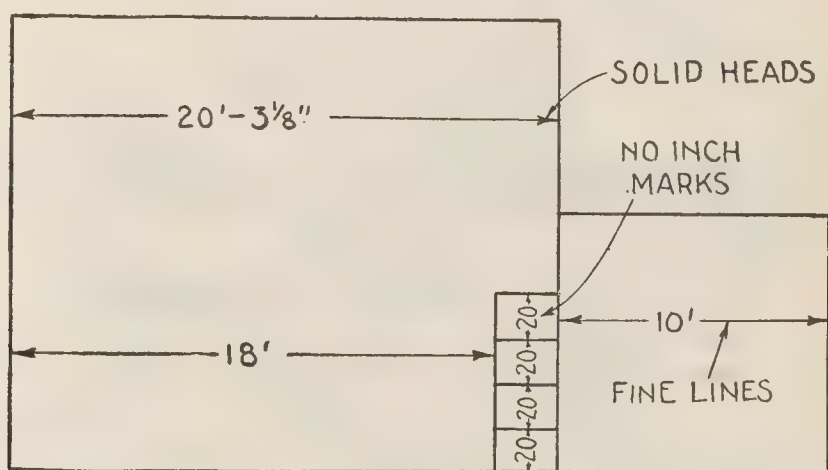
,941.—Method of dimensioning drawings as preferred by the author. *Note*, solid arrow heads that can be seen; fine dimension lines which by contrast are not confused with the lines of the drawing; no inch marks where dimension is in inches only.
